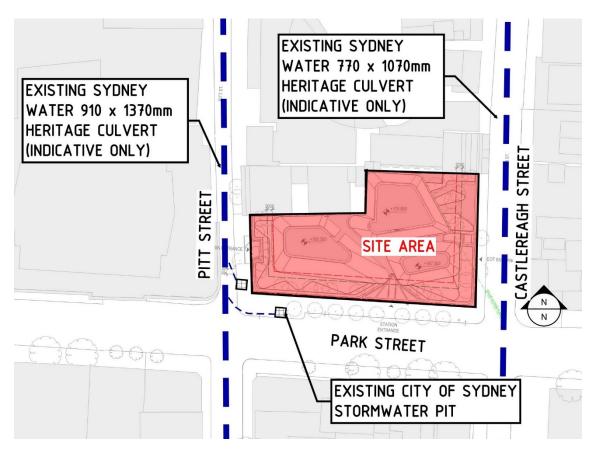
Inground Stormwater Infrastructure (adapted from DBYD plans 16/12/19)
